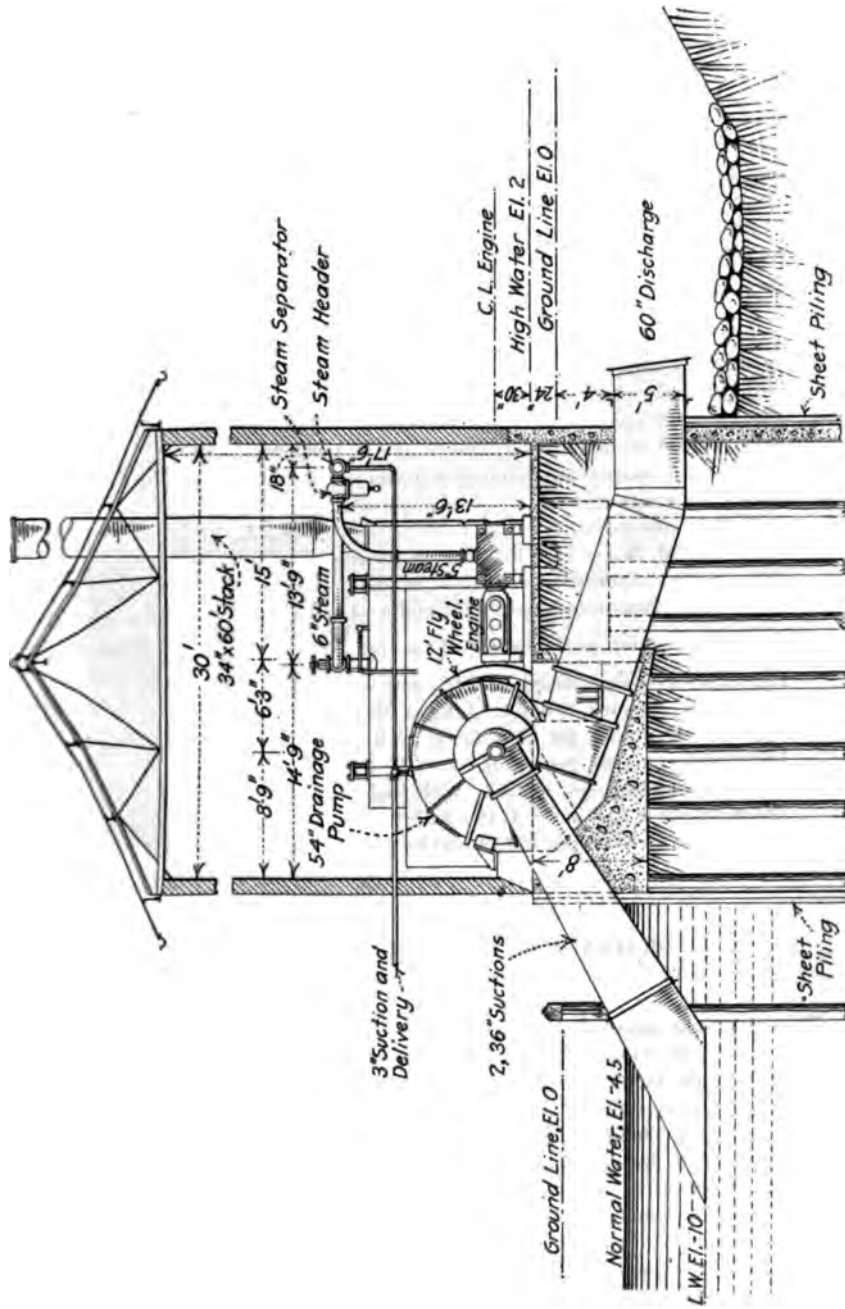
ELEVATION OF WHITELAKE PUMPING PLANT
